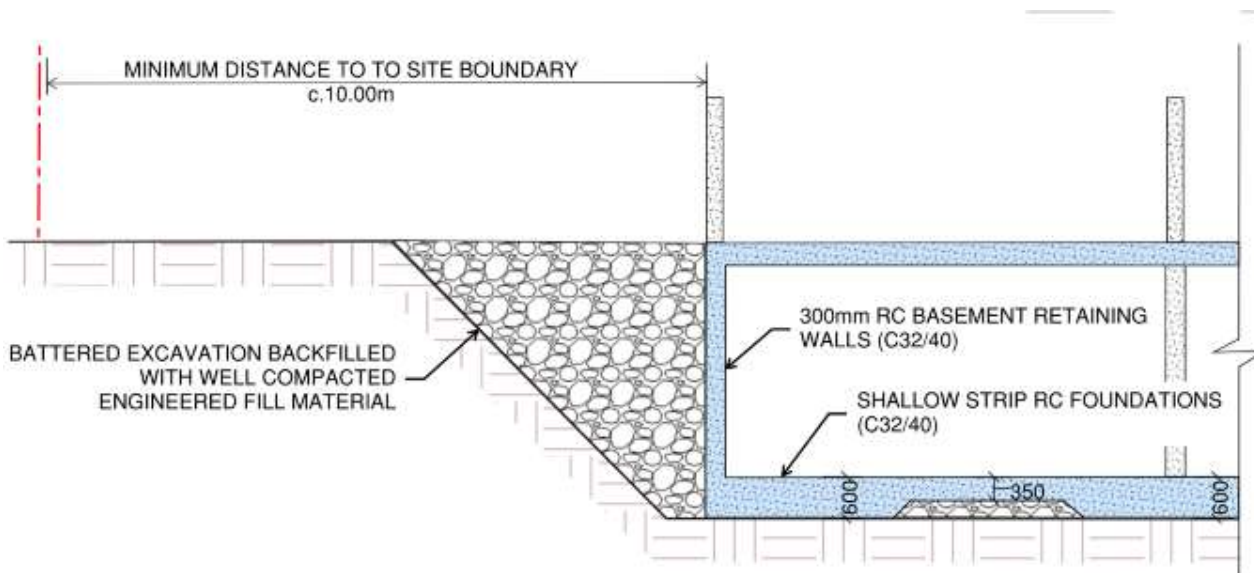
Typical basement section (Waterman Moylan Planning Stage – Structural Report)
